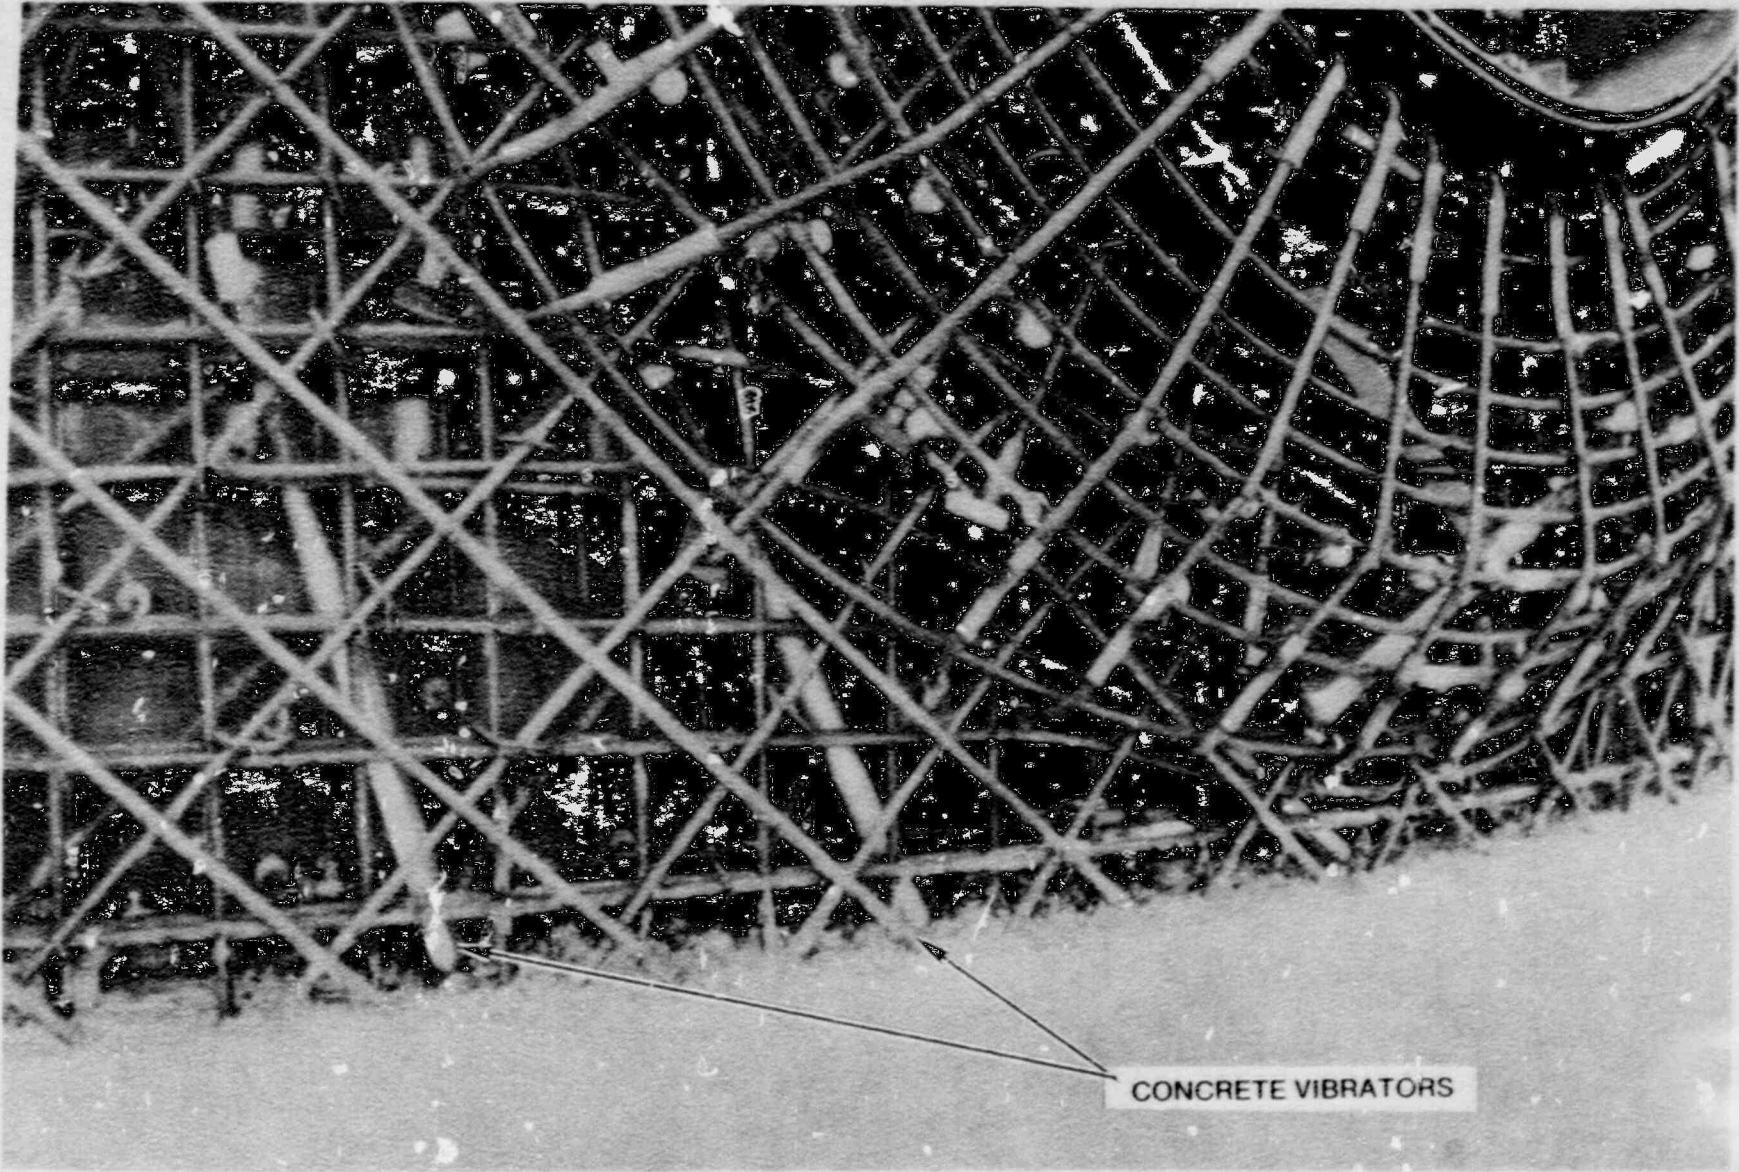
Photograph of Reinforcement Around Equipment Hatch A
